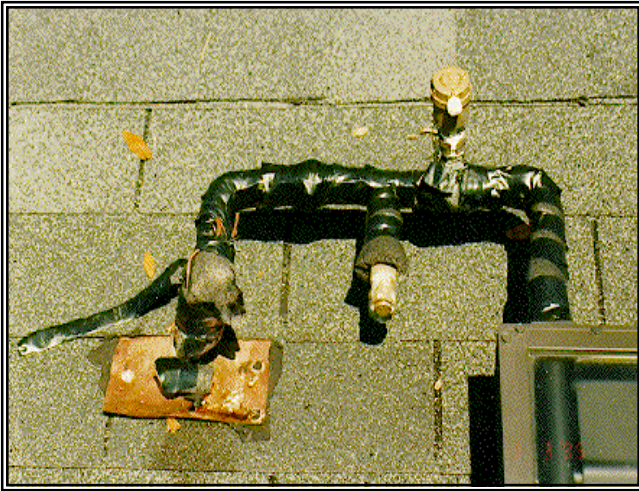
Roof flashing is exposed and improperly sealed.
